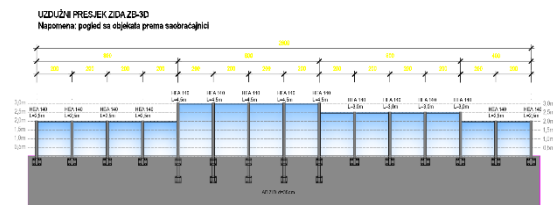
Section of the longitudinal profile of the noise protection wall on the "A" highway
